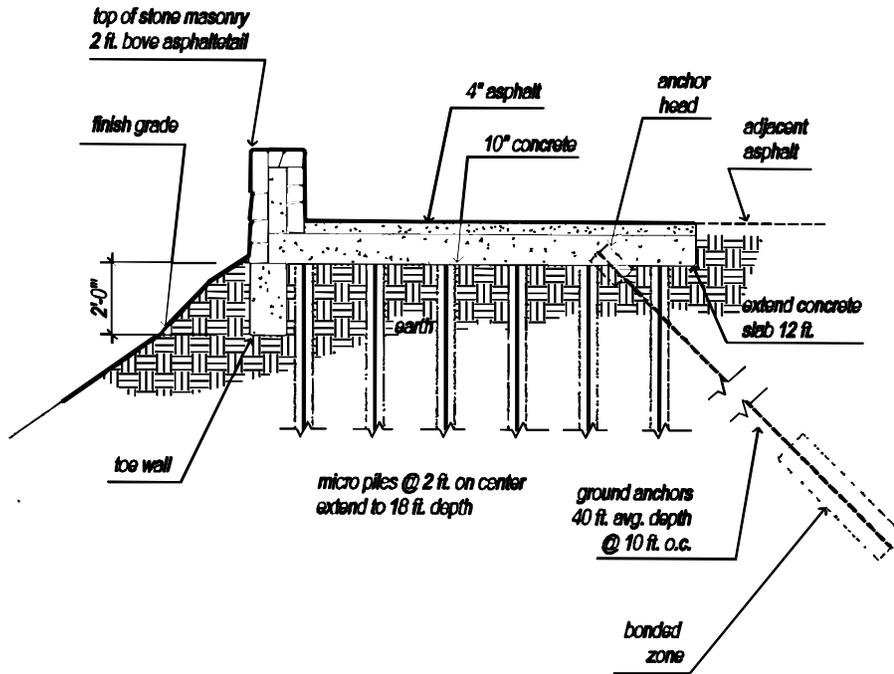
Installation of avalanche-resistant guardwall on concrete slab, anchored with micropiles and tiebacks
